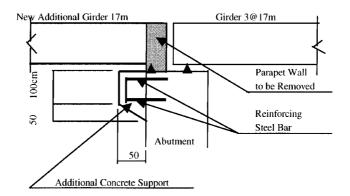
Structural Countermeasure to Pier from Abutment
